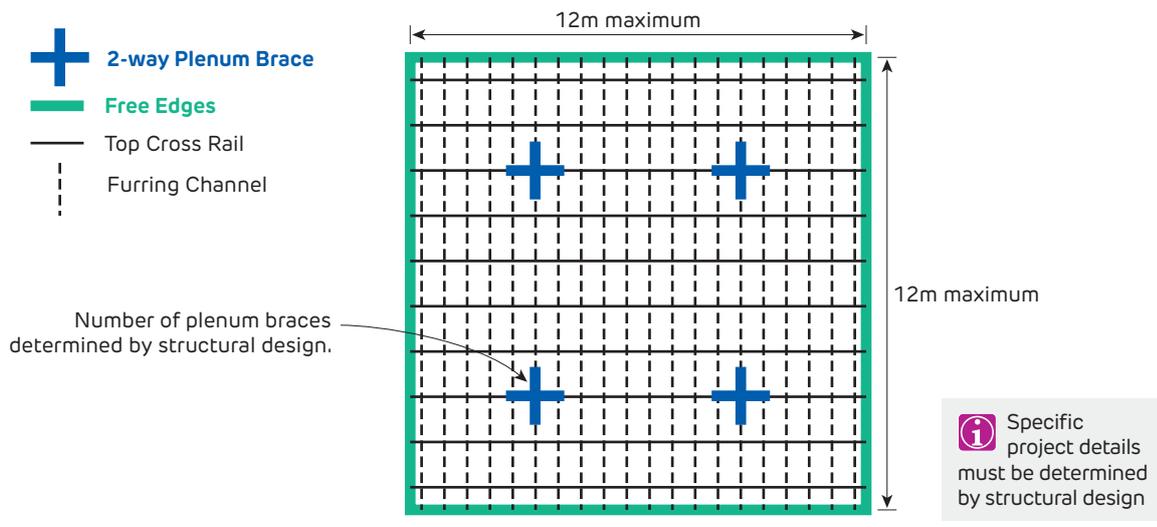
Suspended Ceiling - Type C, 2-way Plenum Braced
